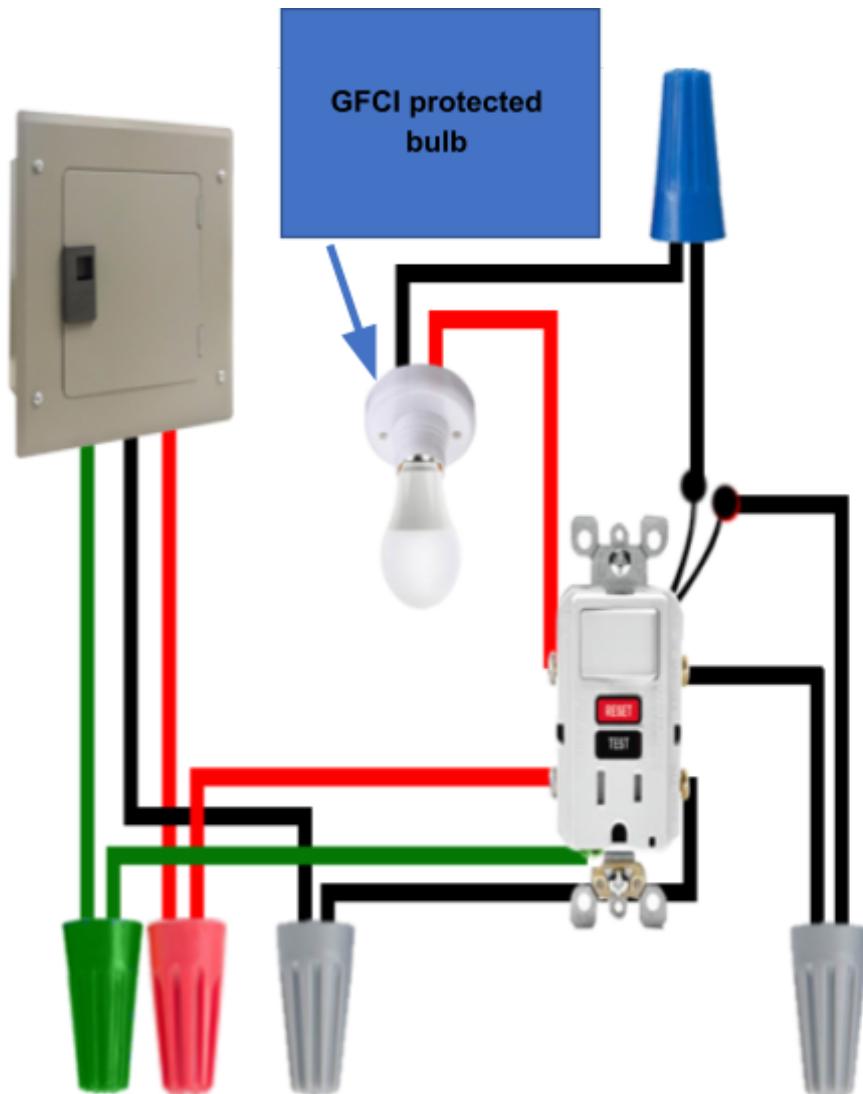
Wiring diagram of GFCI combo switch outlet to a ground fault protected bulb
